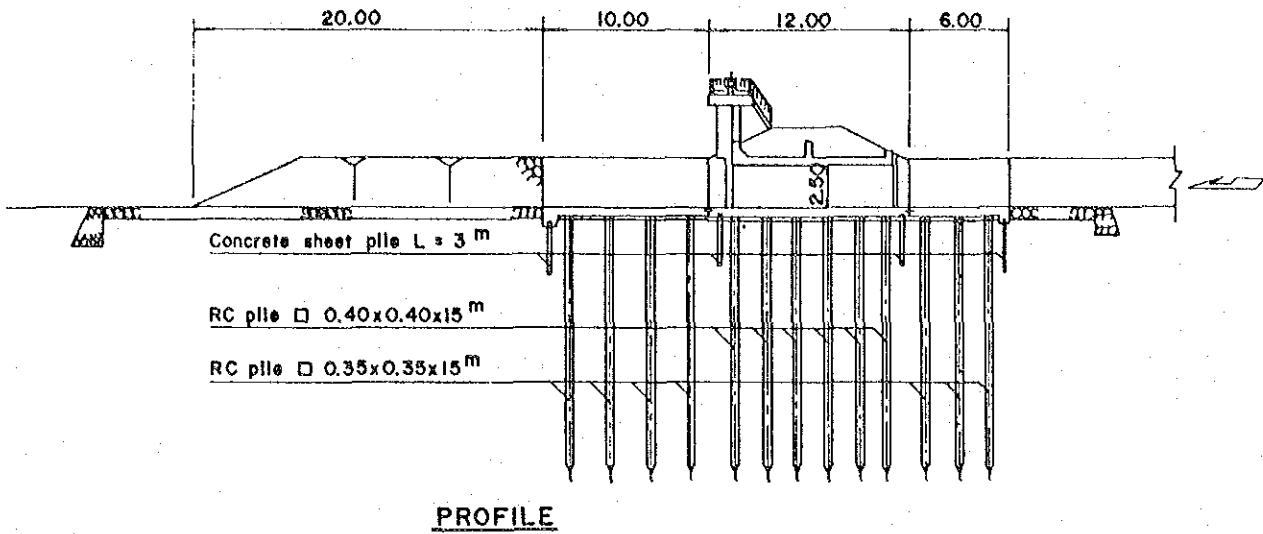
PROPOSED DRAINAGE SLUICE IN KEDUNGSOKO RETARDING BASIN (RIGHT SIDE) (6/6)
